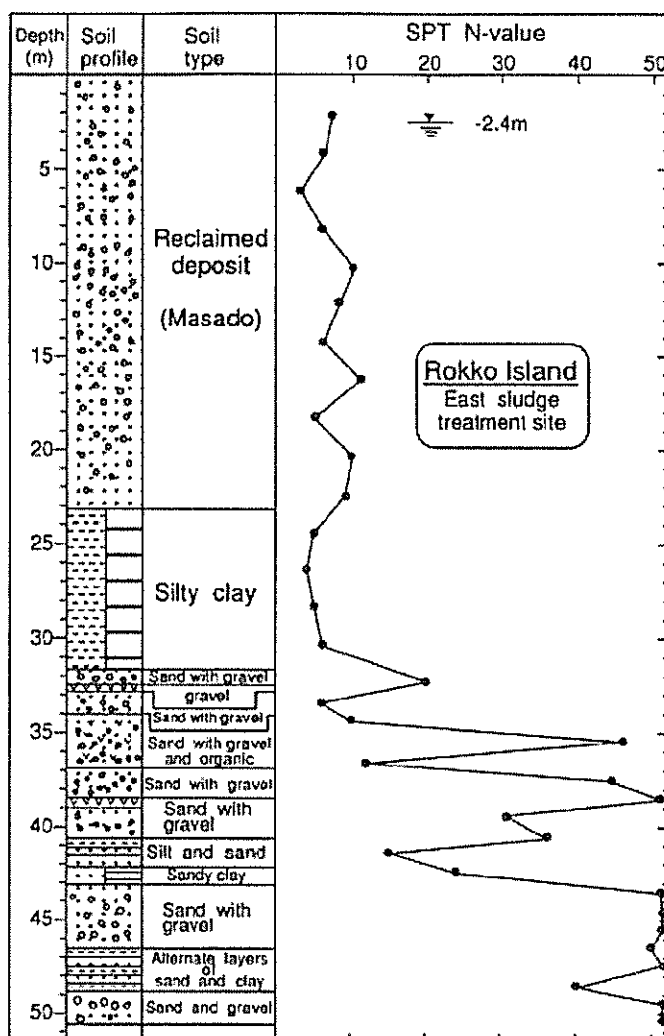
Soil Profile at a Site Near Sections R-2 and R-3 (Hanshin Highway Authority, 1993).
